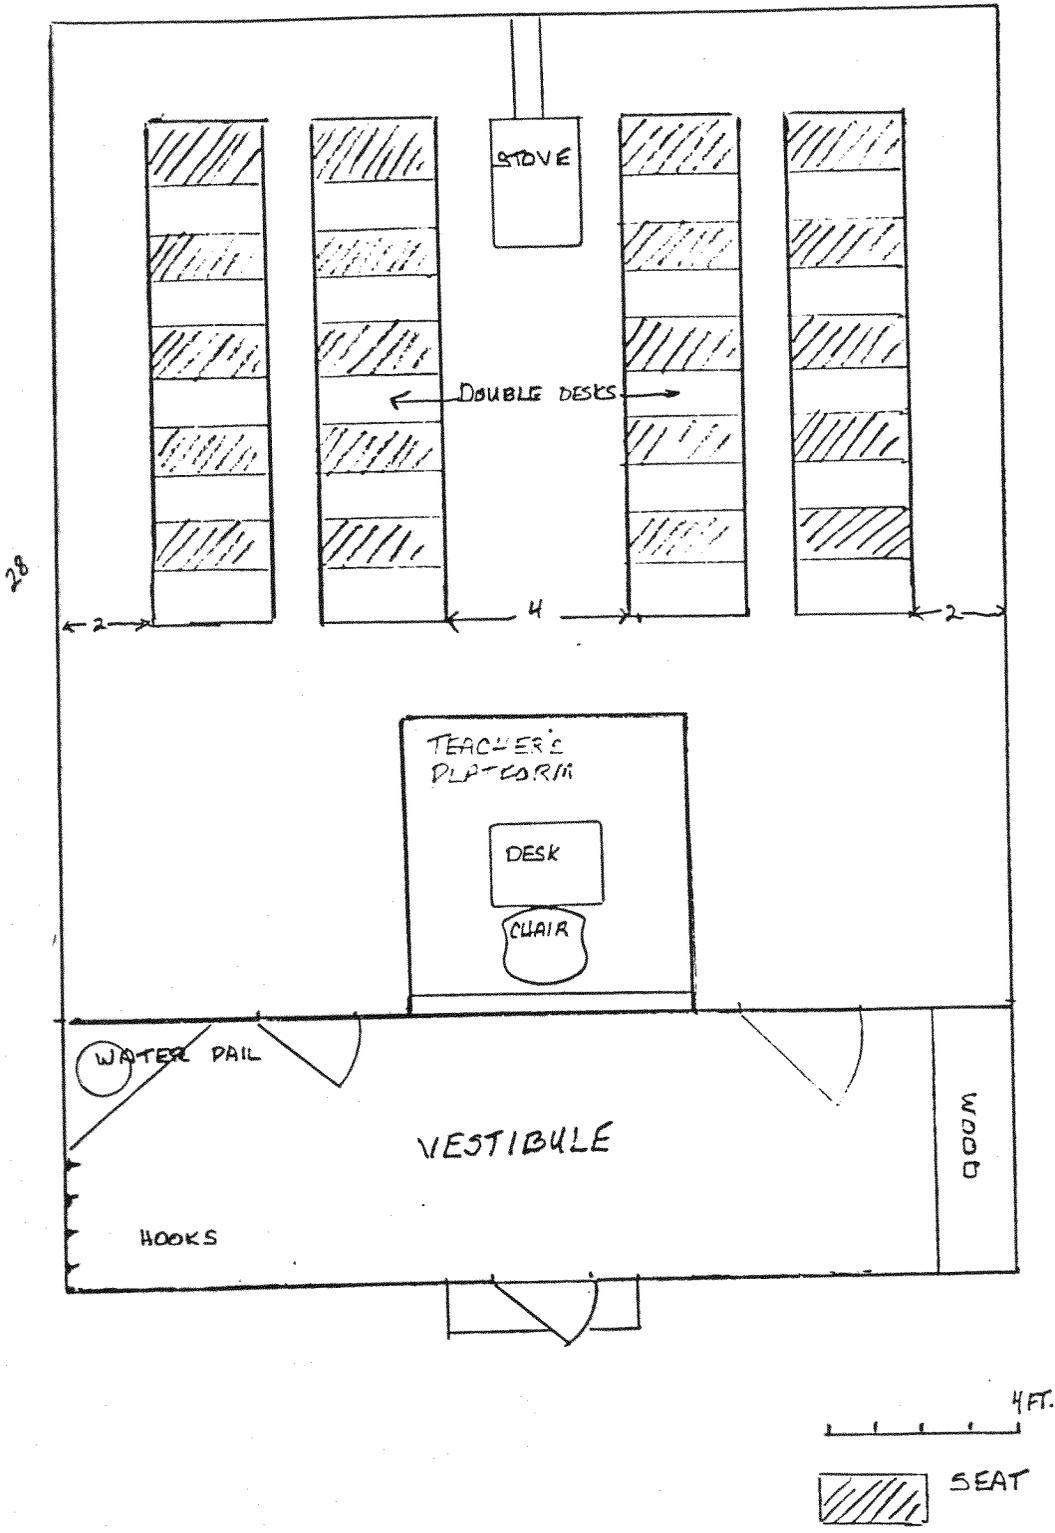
Floor plan of Millbrook School, showing placement of furnishings as proposed in this report.
